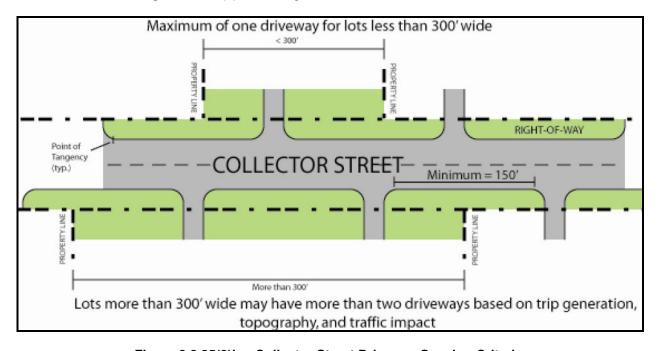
(3)b – Collector Street Driveway Spacing Criteria
